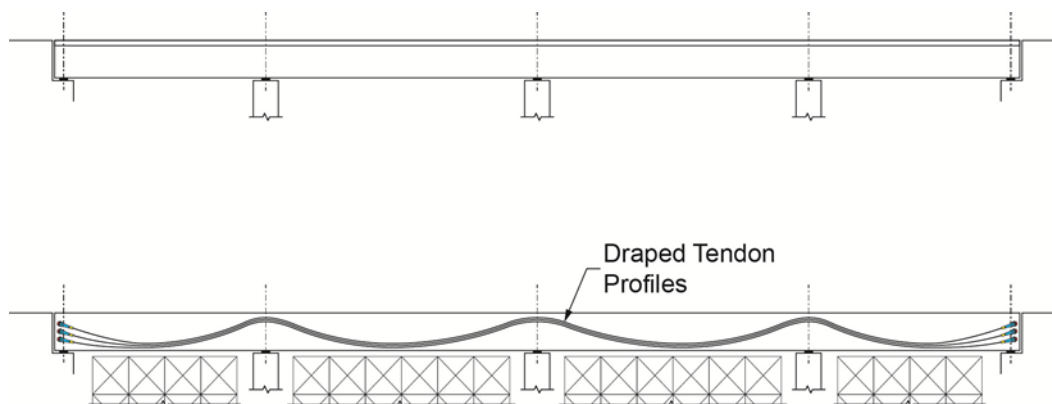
Tendon Layout for 4-Span Bridge, CIP on Falsework
